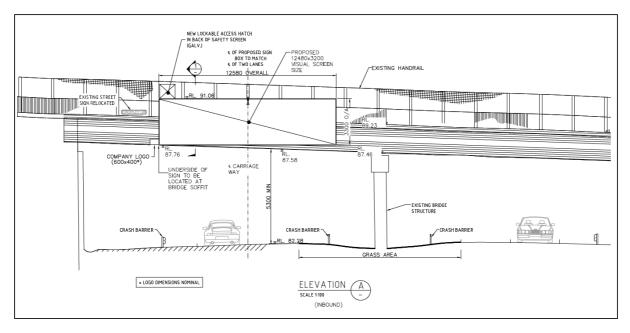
| Plan of the proposed sign (Source: Applicant's SEE)
